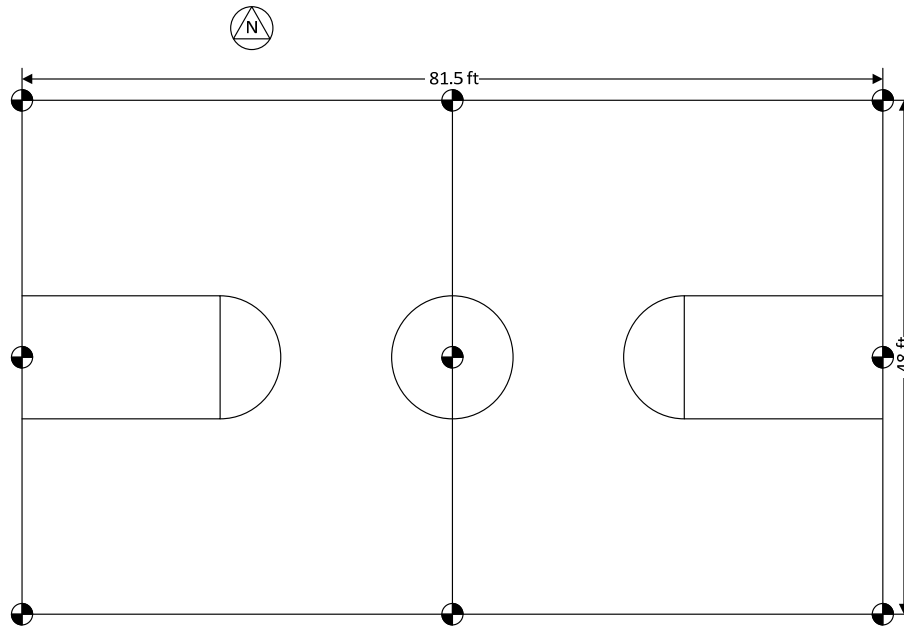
BASKETBALL COURT MEASUREMENT LAYOUT
